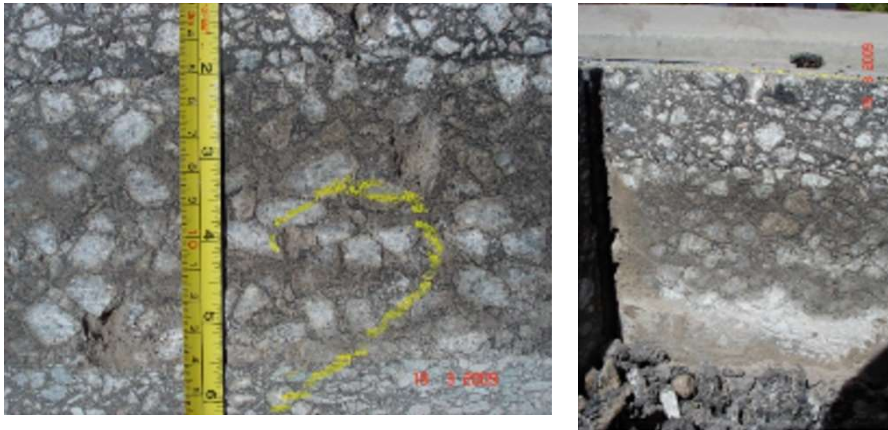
Pavement with 3 layers of asphalt approximately 200 mm thick.
